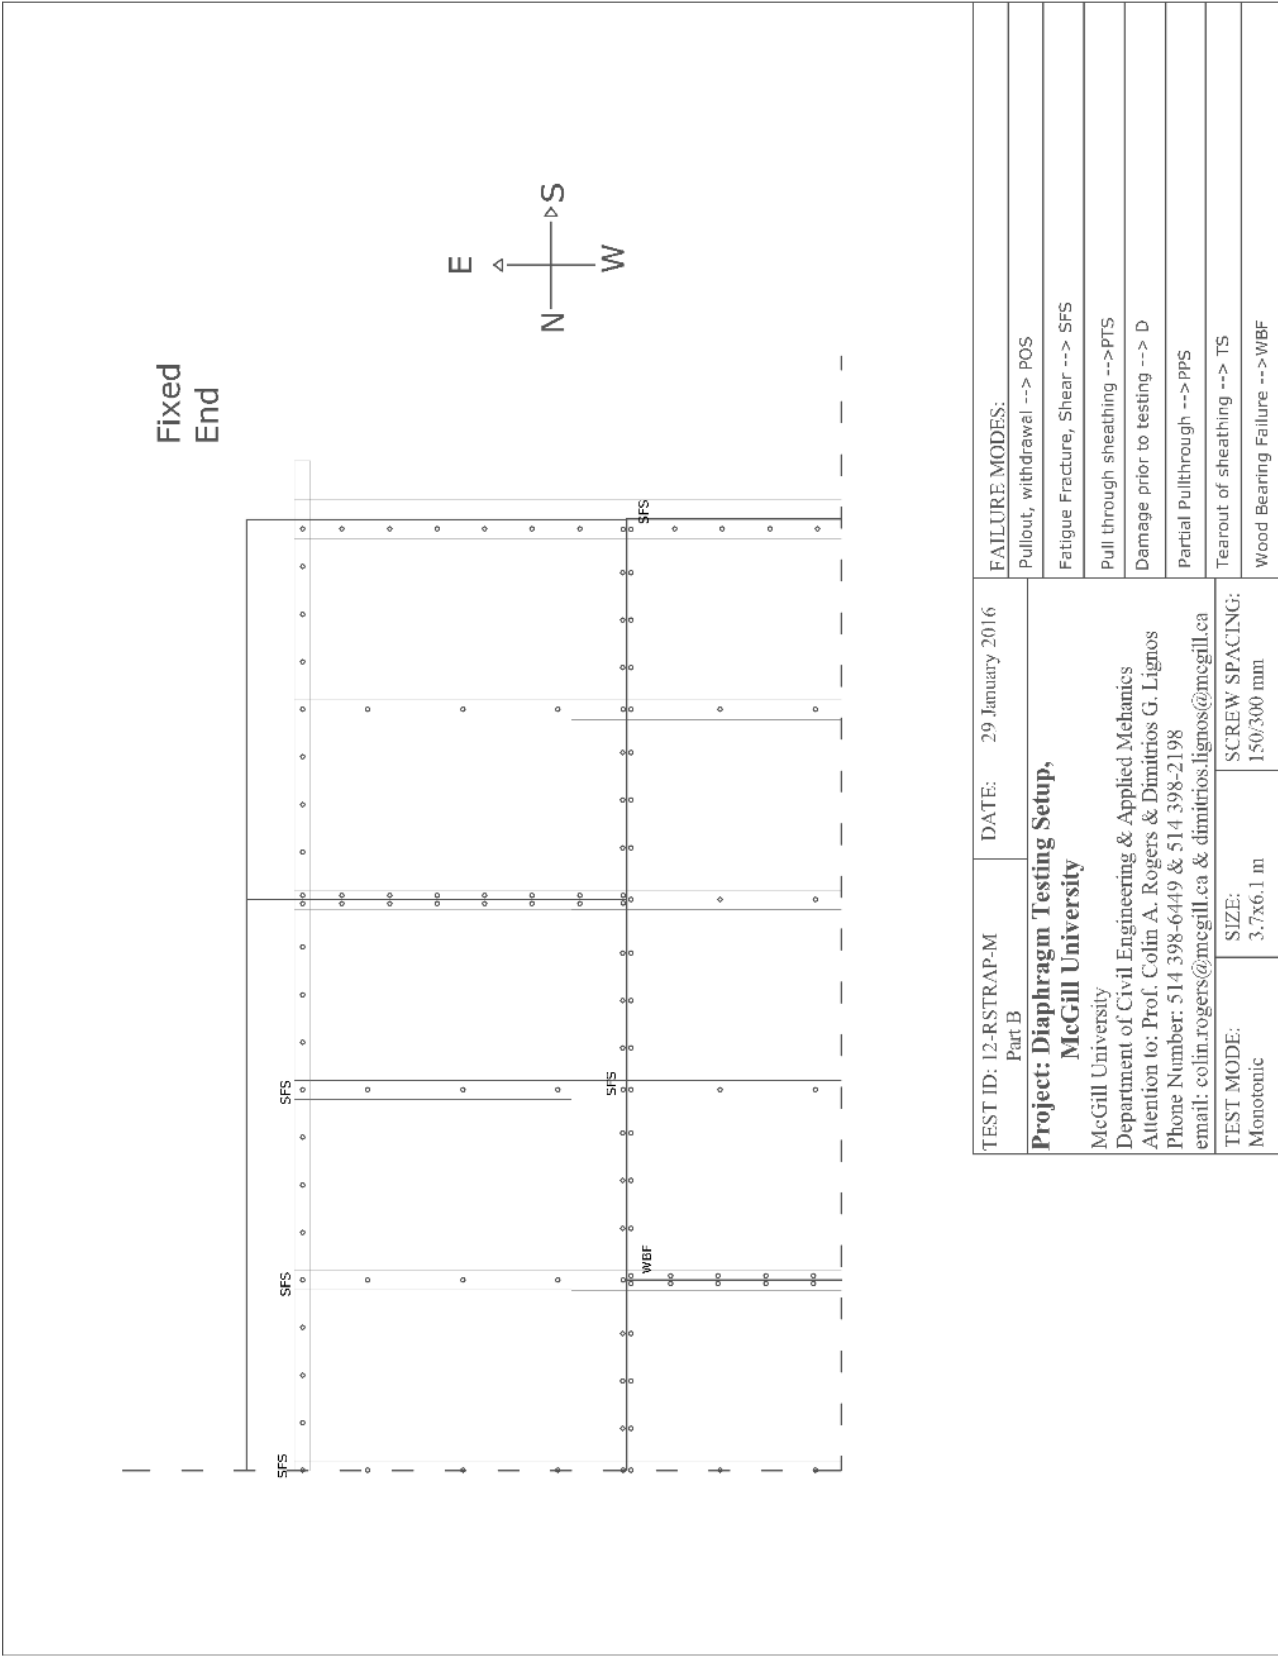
Sheathing Fastener Failure Modes Part B Specimen 12-RSTRAP-M
